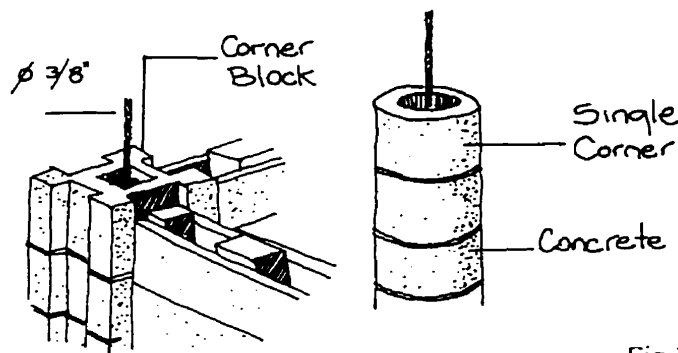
Detail of houses' corner and single columns (After Yruegas, 1978)
